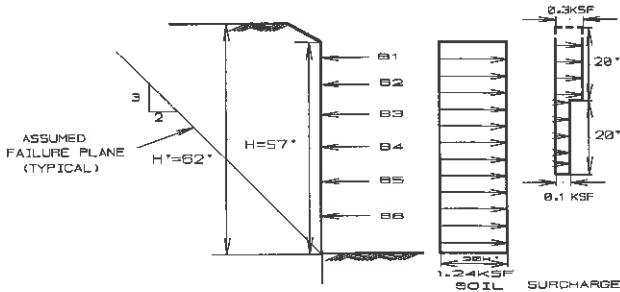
TYPICAL LOADING DIAGRAM FOR PEARL ST. & HIGH ST.
